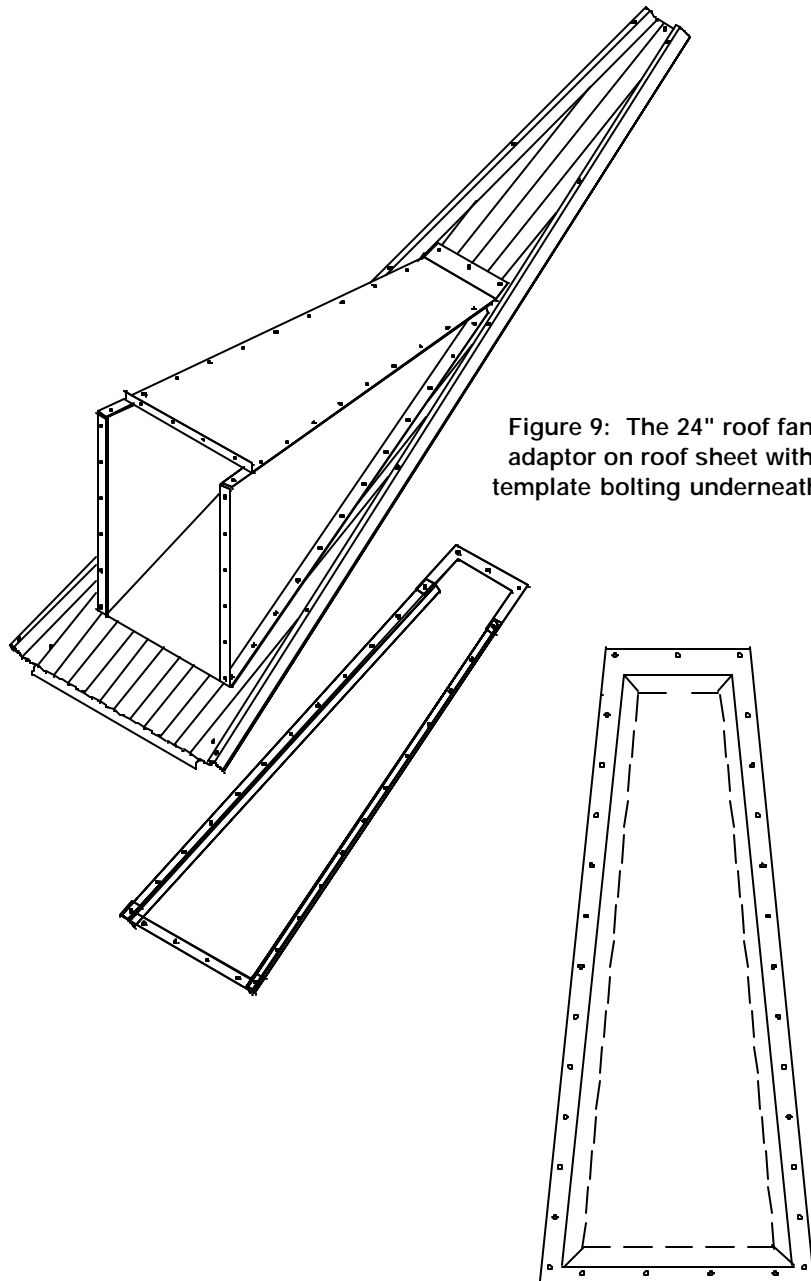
The 24" roof fan adaptor on roof sheet with template bolting underneath.
